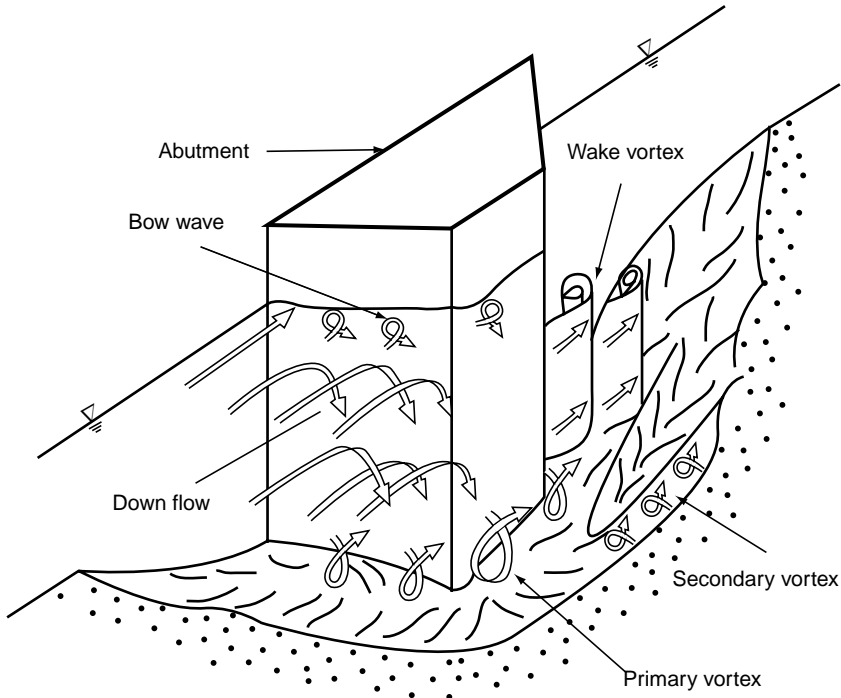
Schematic sketch of flow field at an abutment (Ref. 18)
